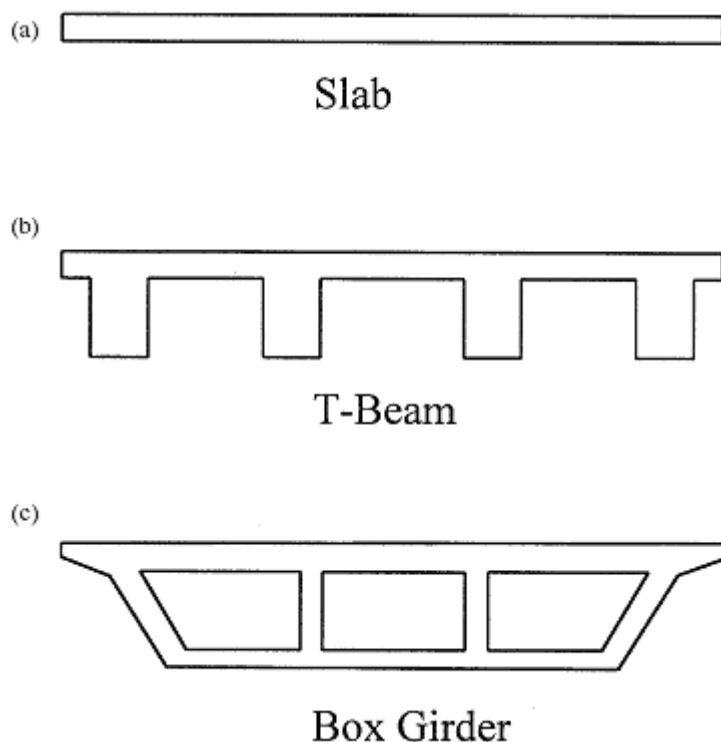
Typical reinforced concrete sections in bridge superstructures: (a) solid slab; (b) T-beam; and (c) box girder
